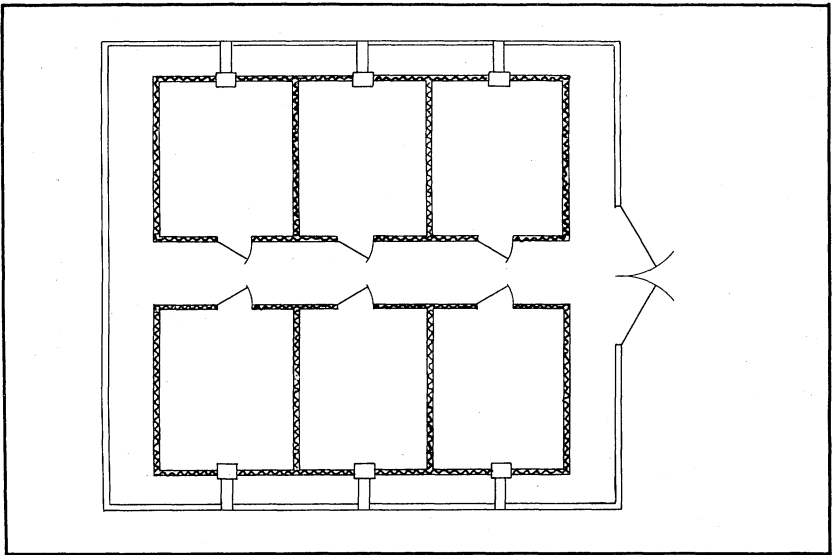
This floor plan shows arrangement of chambers within the buildings.
